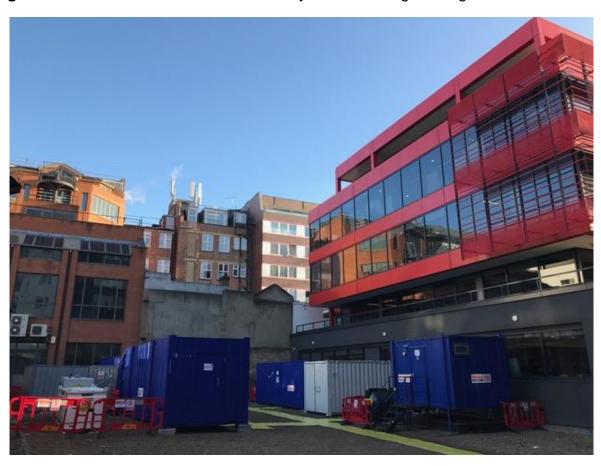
View from the site towards the rear elevation of office buildings at Britton Street.
